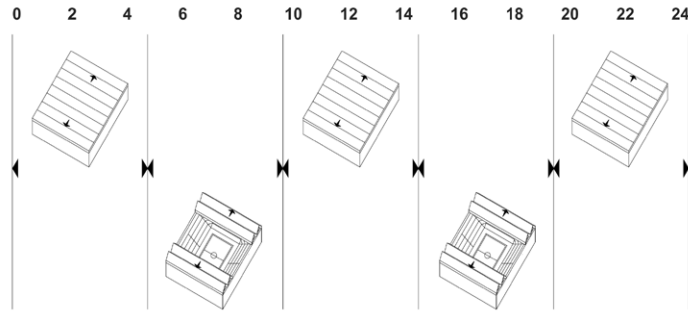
Demonstration of roof structure movement in buildings with regularly opening and closing roofs (daily opening and closing).
